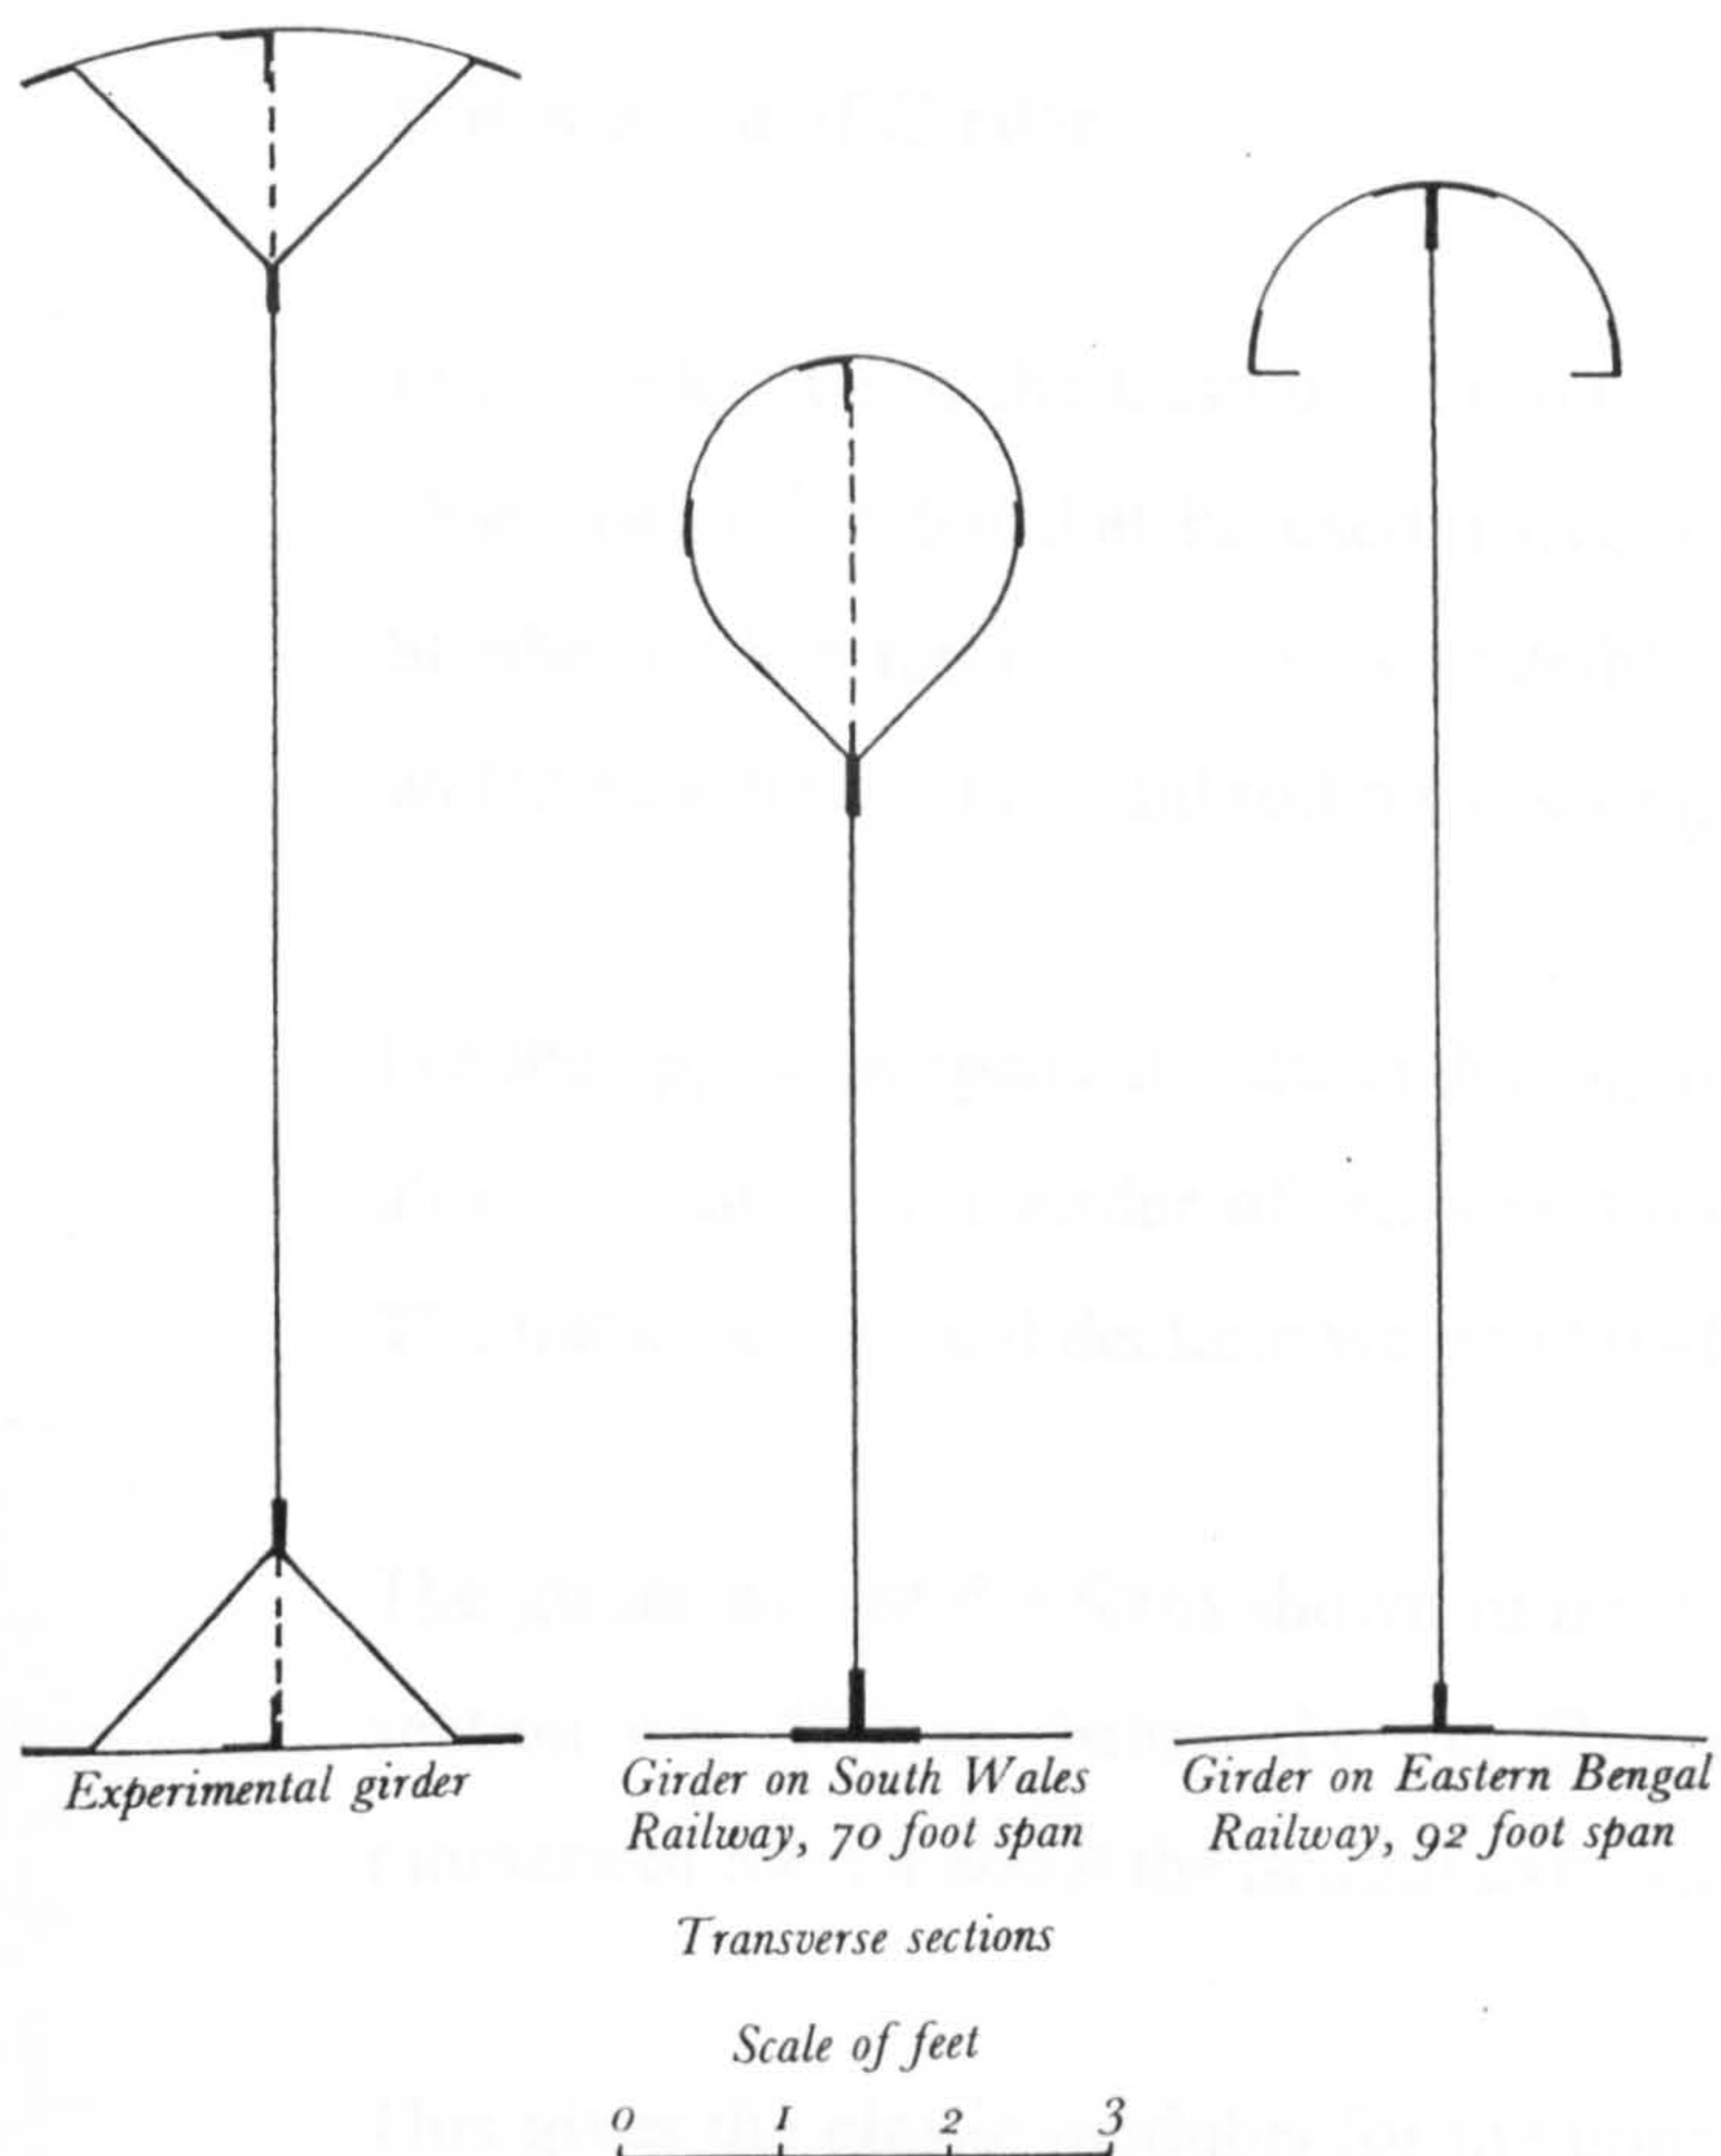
Types of wrought-iron girder used by Brunel. Cross Sections not drawn to scale; dotted lines represent cross diaphragms.
